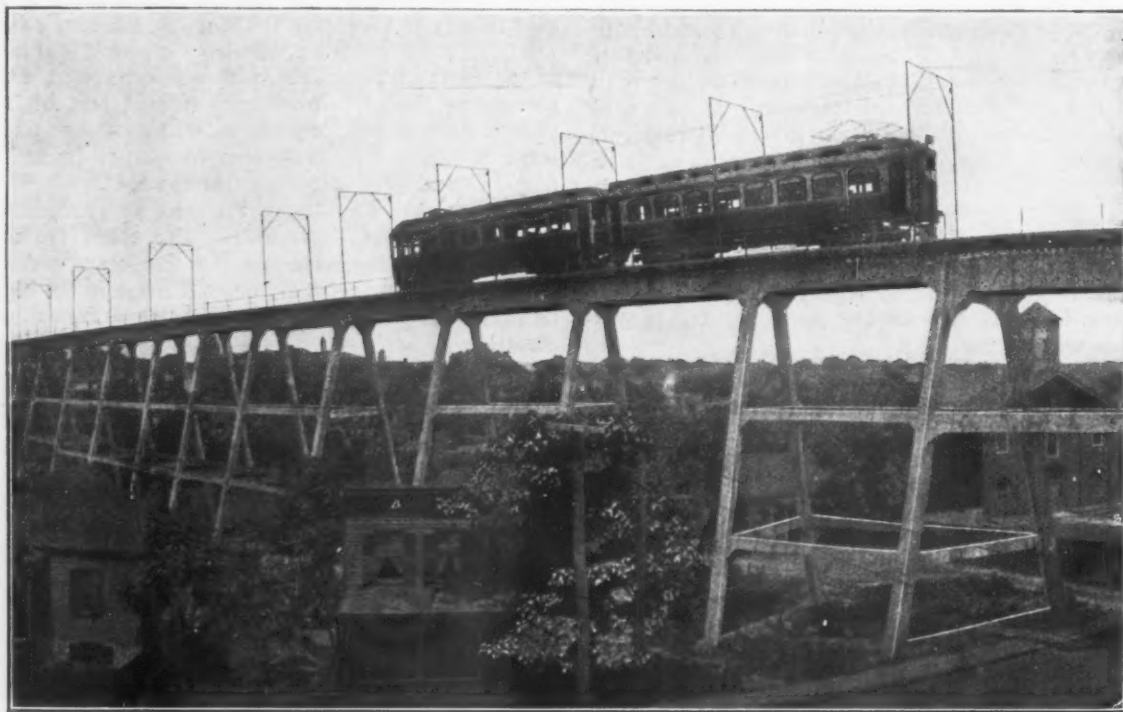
A Reinforced Concrete Viaduct at Richmond, Va., Built for the Richmond and Chesapeake Bay Railroad.
